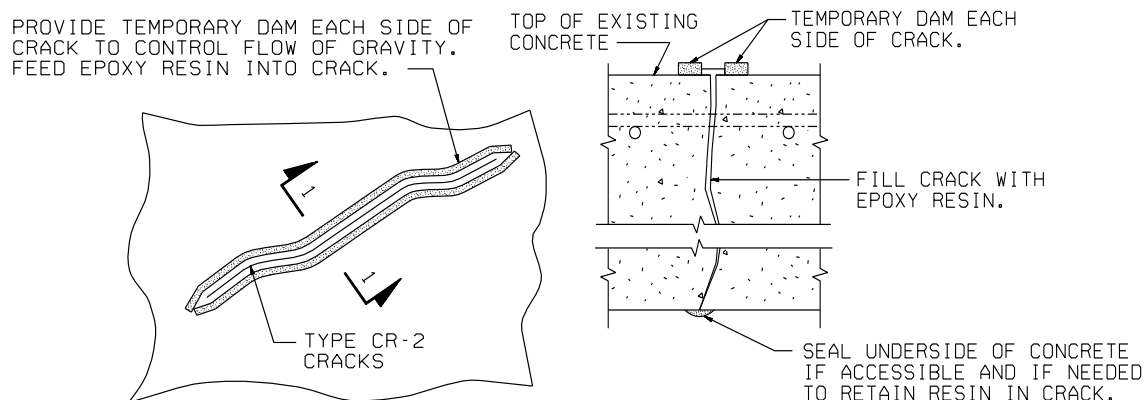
Section 1-1 – horizontal surface crack repair detail (for cracks 0.8 mm (1/32”) wide and greater) (FHWA, 2005).
